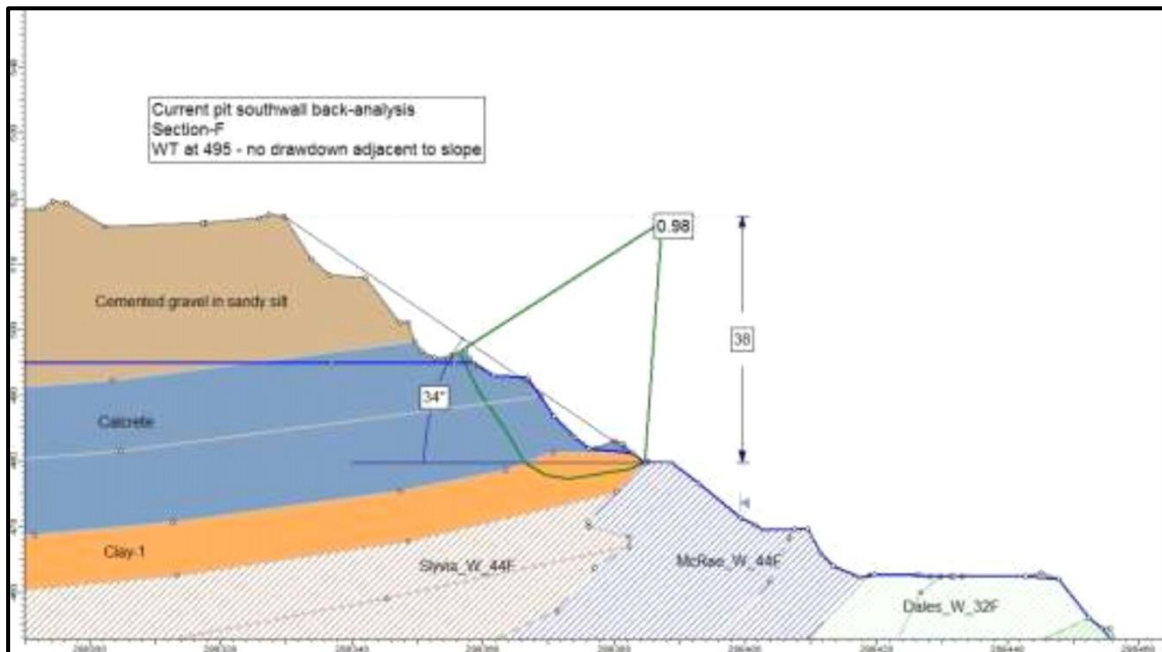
Geotechnical Slope Stability Section F (Snowden 2012)
